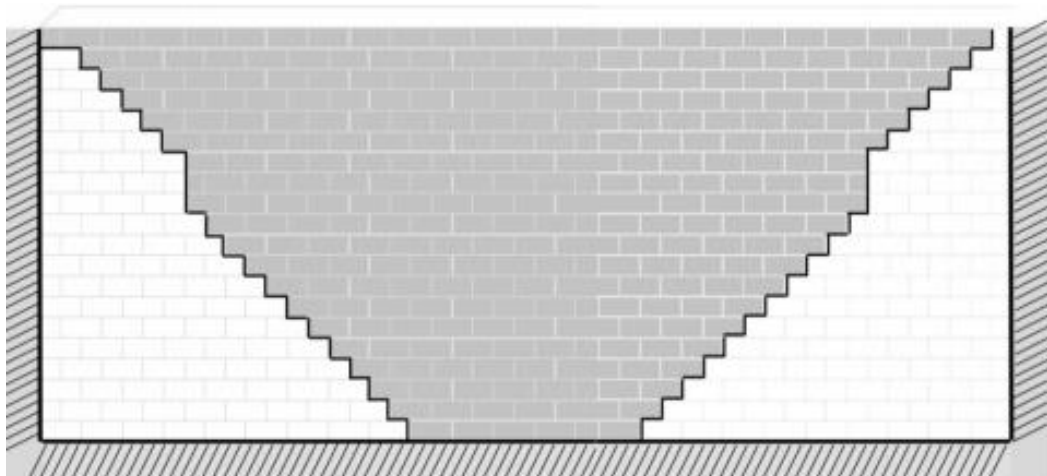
Schematic Example of Cantilever U-type Wall Failure
